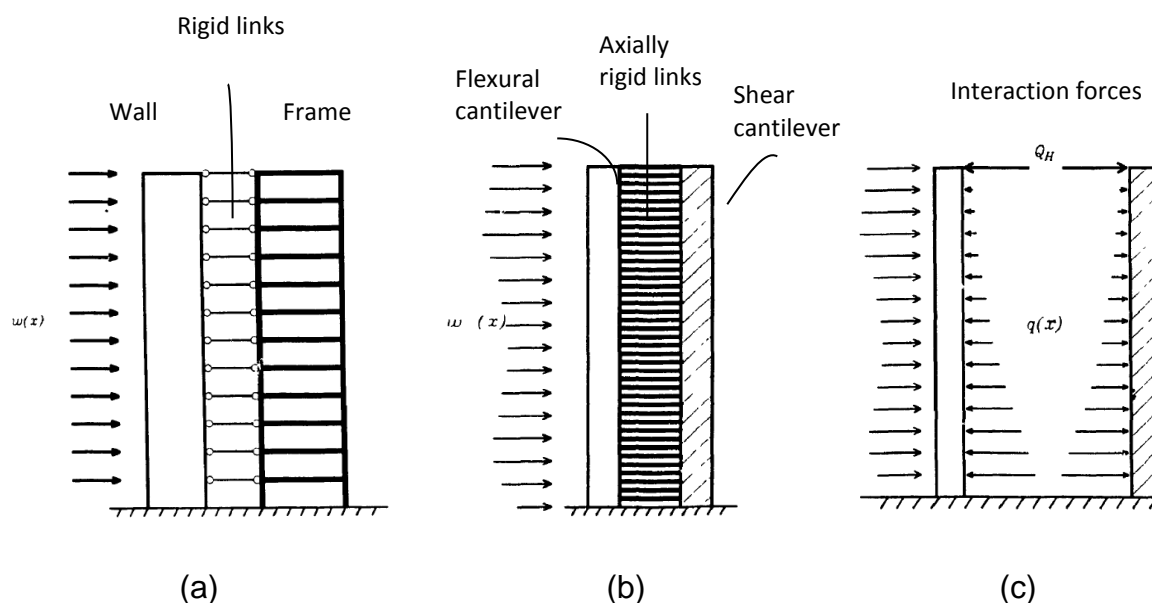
(a) Planner wall frame structure; (b) continuum analogy for wall frame structure; (c) free body diagram of wall and frame [59].
